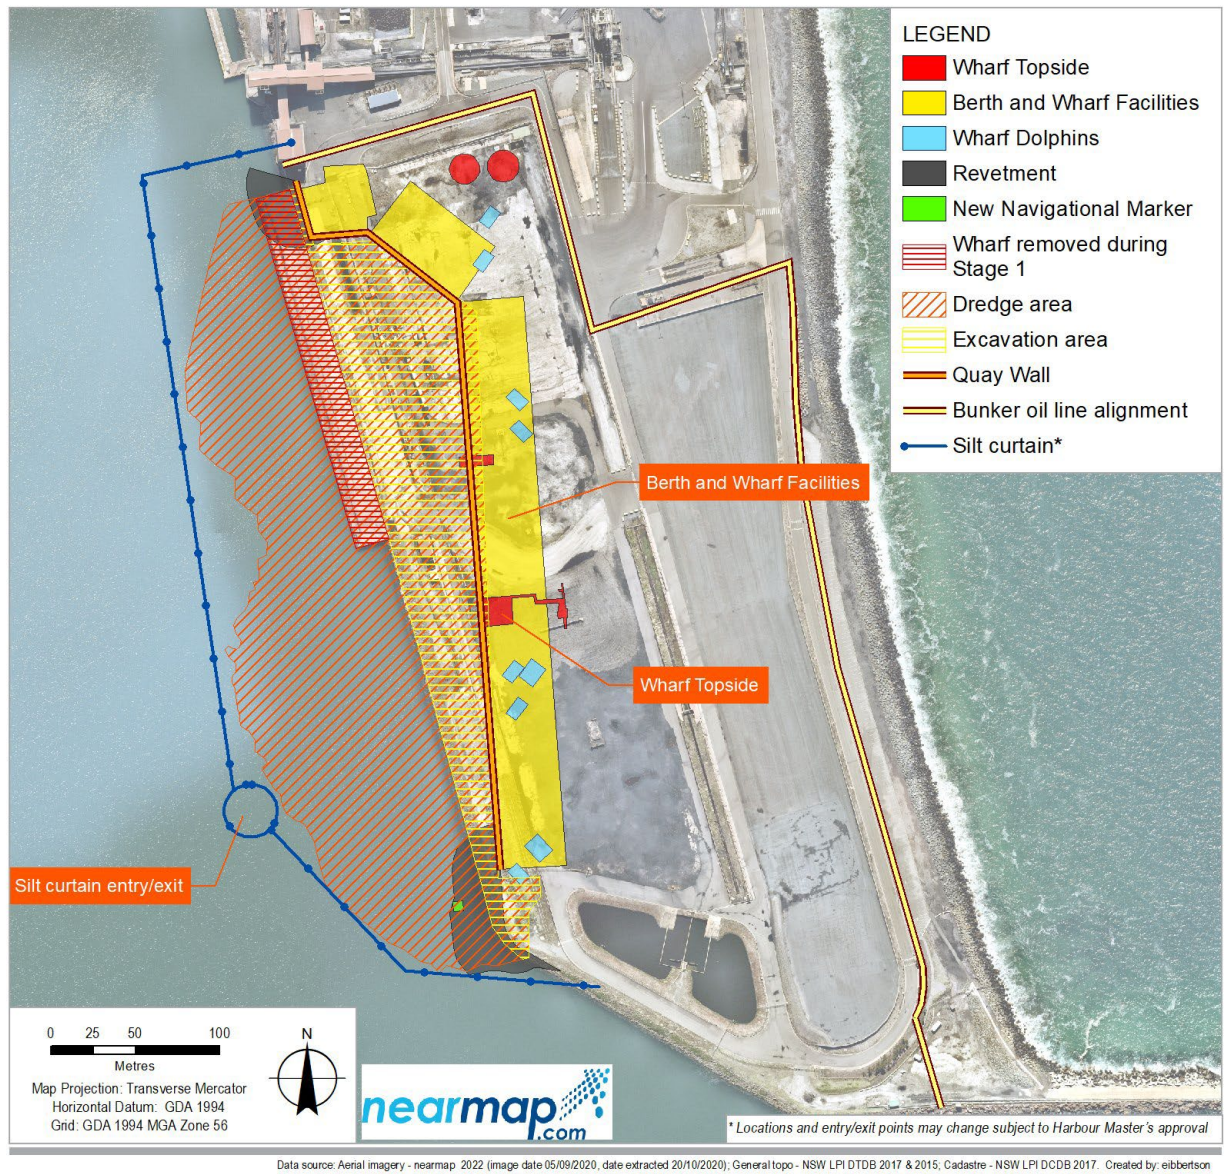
Dredging and excavation works for MBD Site Compound (Stage 2B)
